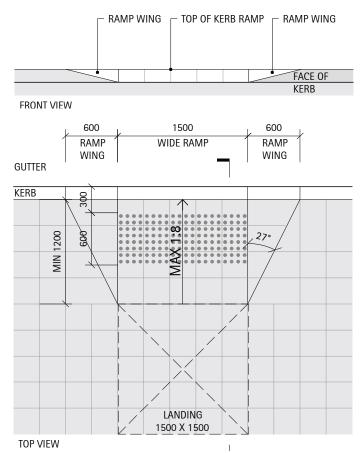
Kerb Ramp Layout: 2100 Wide
